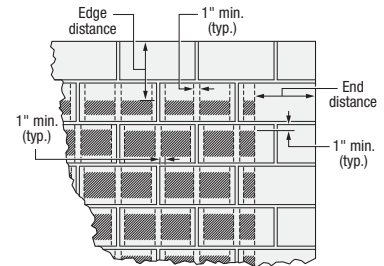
Allowable Anchor Placement in Grouted CMU Face Shell
